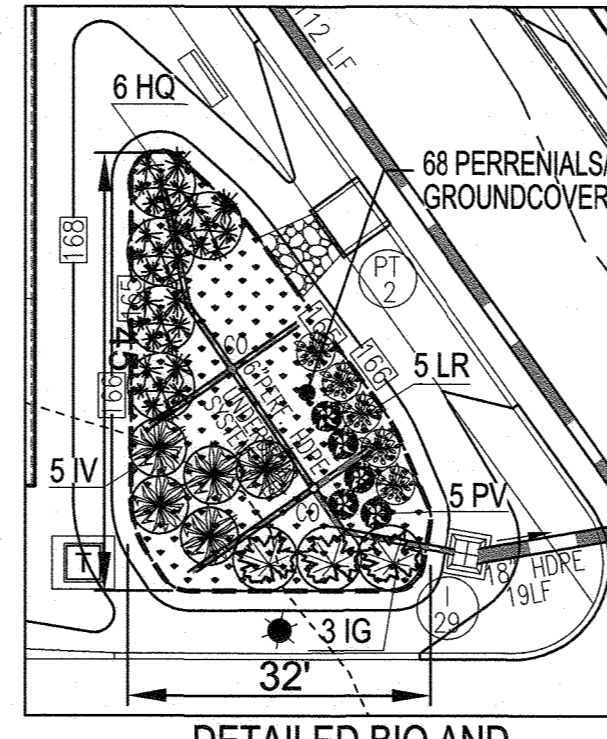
DETAILED BIO AND PLANTING PLAN (SWM #14A, 14B)
